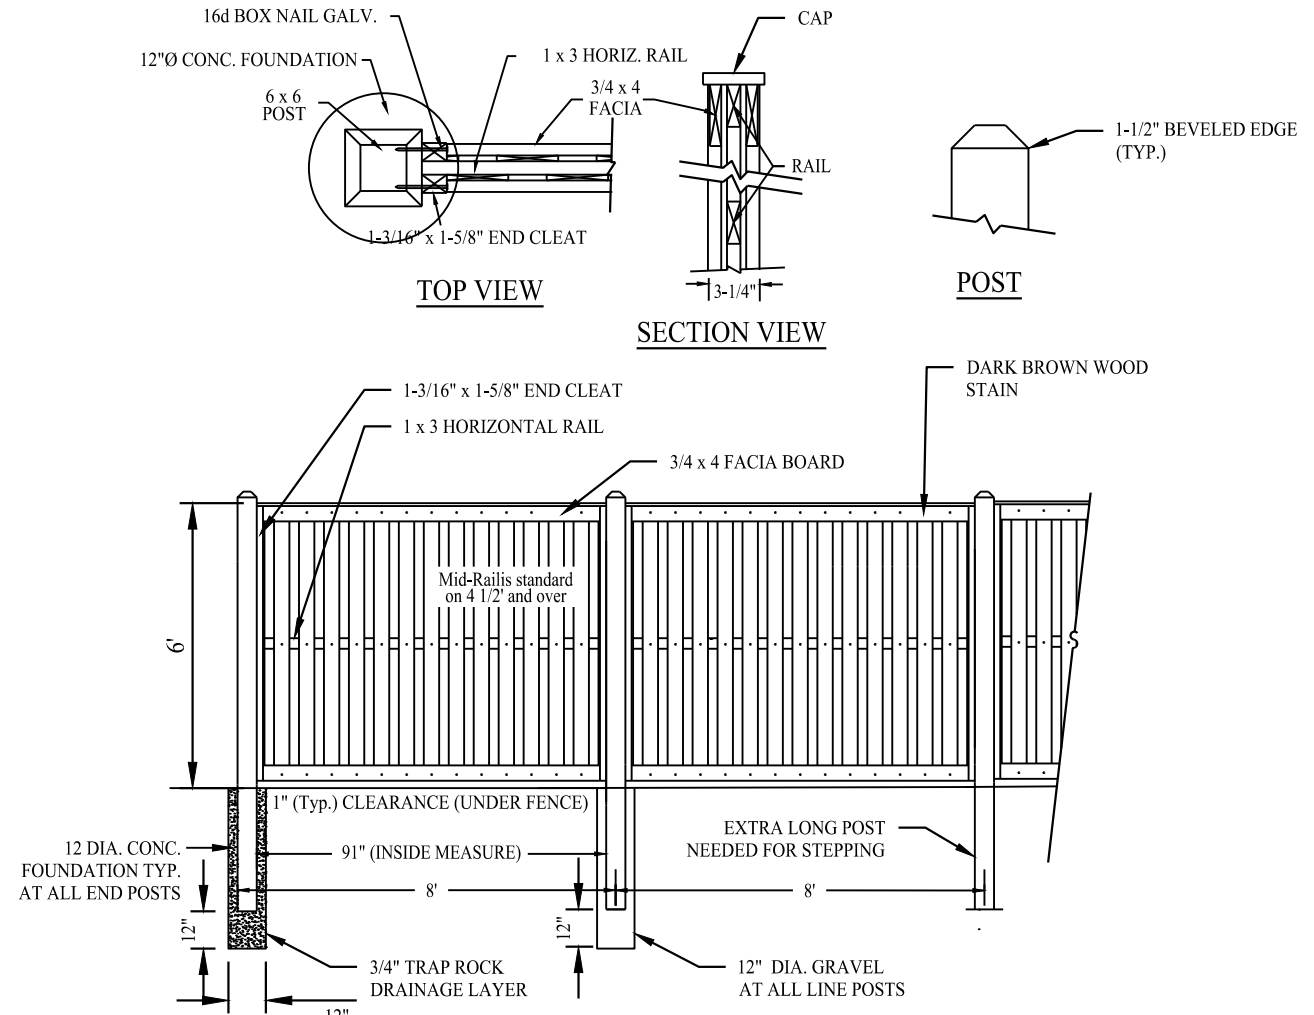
DETAIL PROVIDED BY BOSTON ENGINEERING DIVISION
